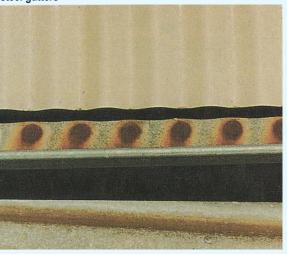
Water flowing from a glass roof onto zinc-coated steel roofing
